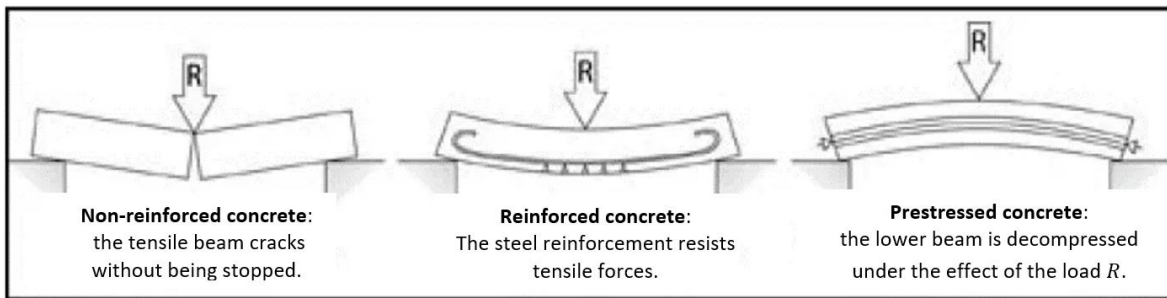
Diagram illustrating the differences between plain concrete, reinforced concrete, and prestressed concrete.
